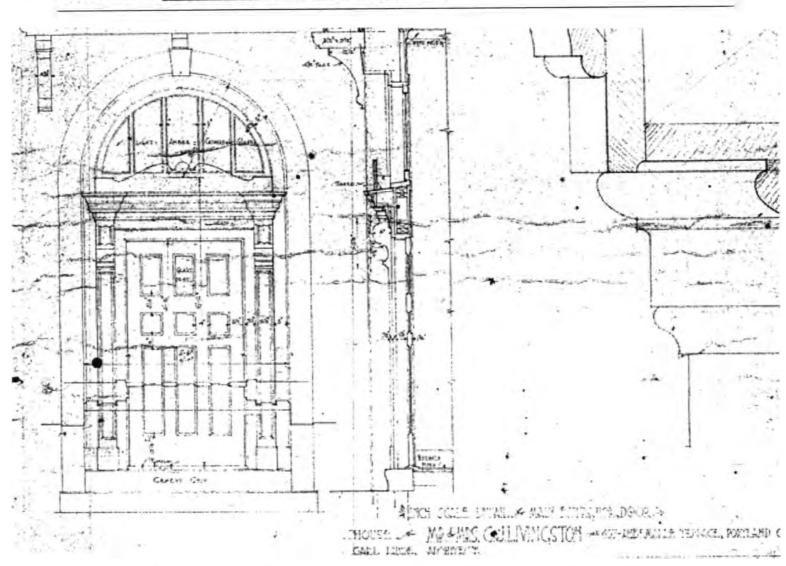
Original drawing for the C.J. Livingston House, showing front door detail.
